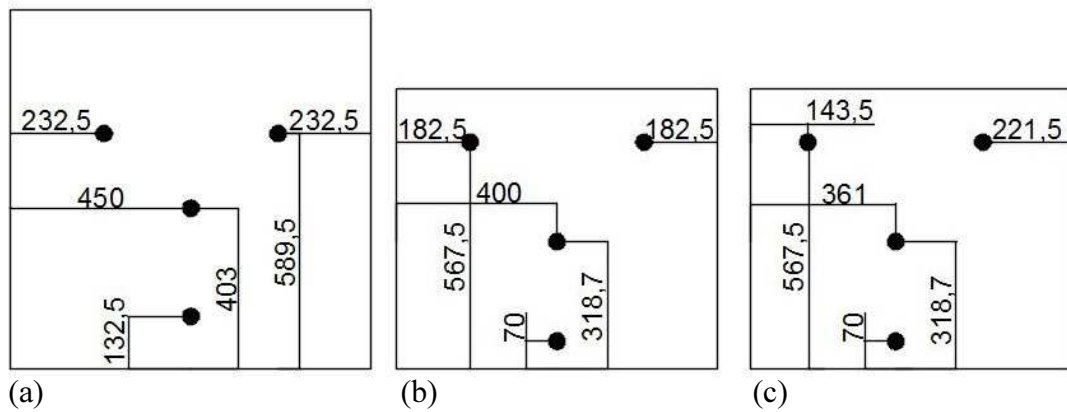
In-depth thermocouple layouts for (a) encapsulated ceilings, (b) encapsulated back wall, (c) encapsulated side walls. All dimensions in mm from timber-timber interfaces (encapsulation not considered).
